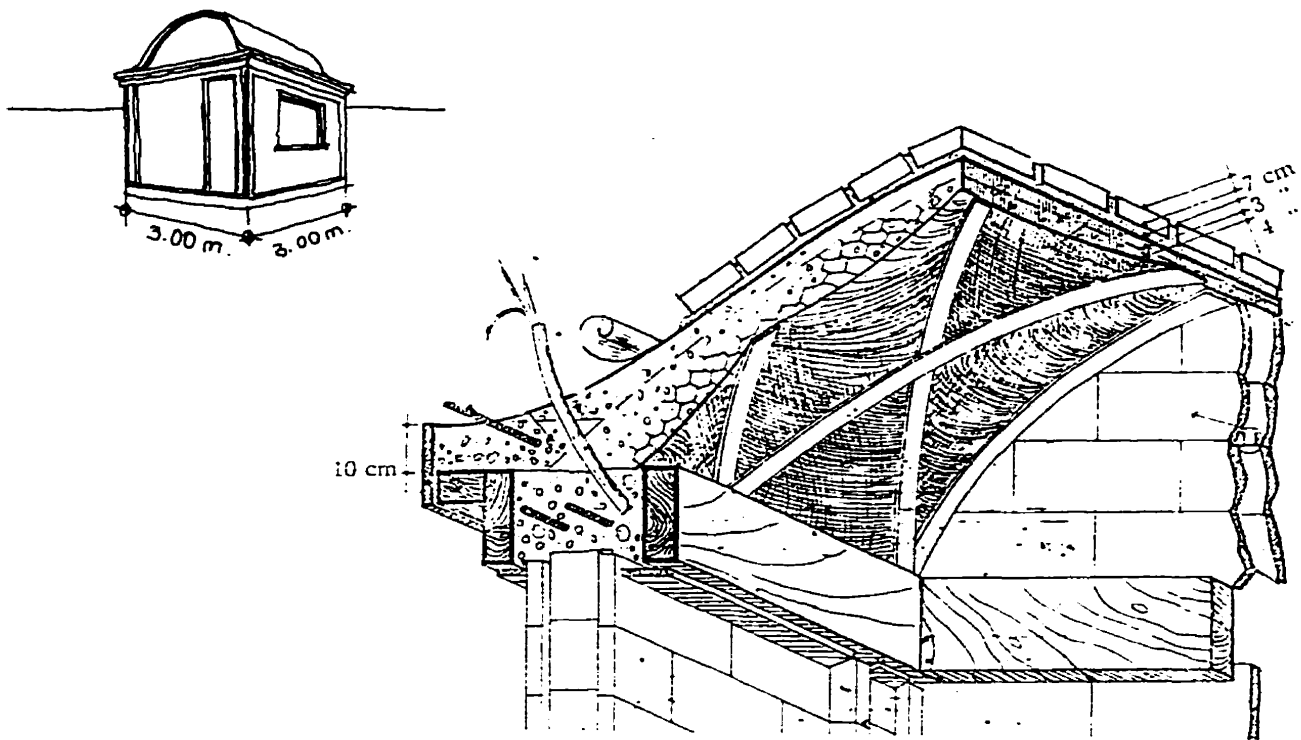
Roof structure of the Mexicali project houses (Yruegas, 1978)
